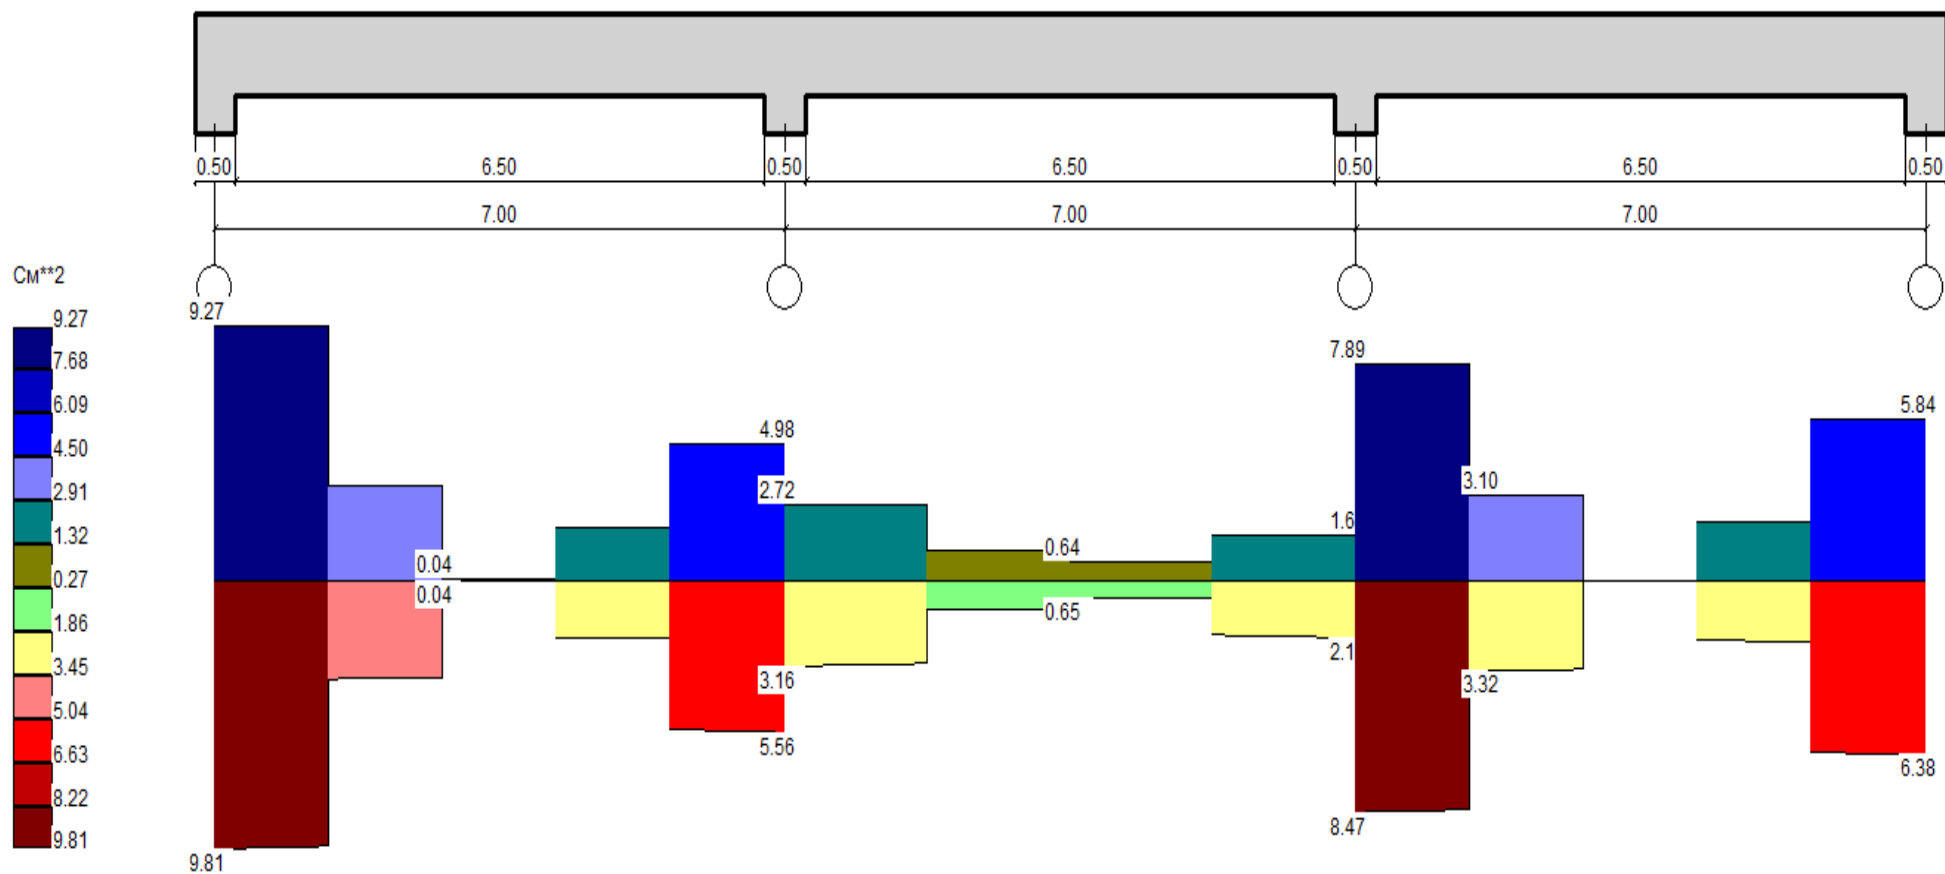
Variant of a building with a beam - slab floor. Beam B2-3. Theoretical diagram of transverse reinforcement
